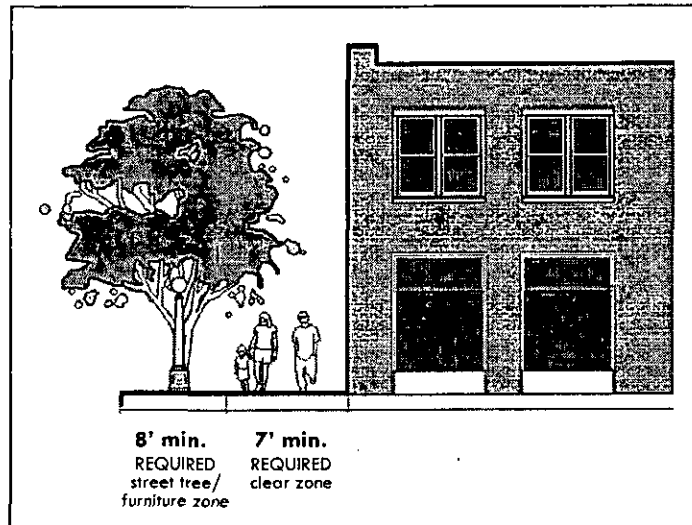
Core transit corridor sidewalk requirements. Street trees are required along core transit corridors with an average spacing not greater than 30 feet on center.
